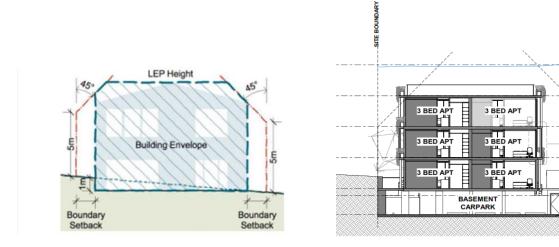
DCP Chapter V3 – Building Envelope and Section B Plan
